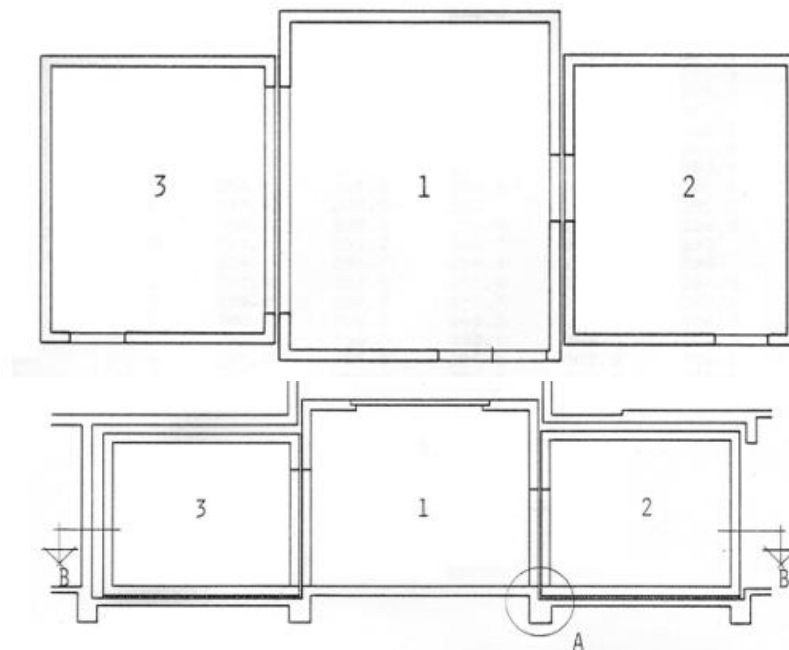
Laboratory configuration: horizontal, vertical section in the measurement rooms
